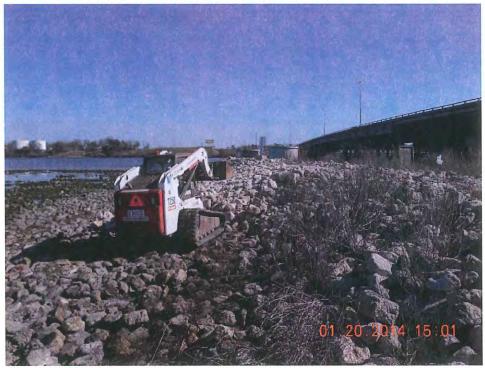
Skidsteer placing Armor Cap D rock in the South Berm enhancement area.
